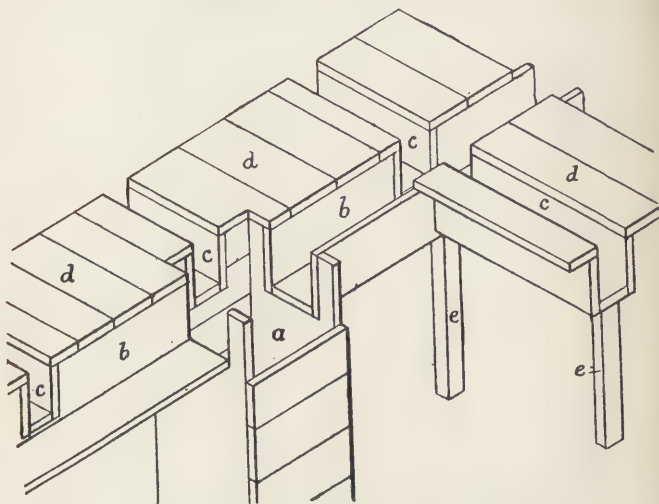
Column, Beam, and Floor Slab Moulds.
